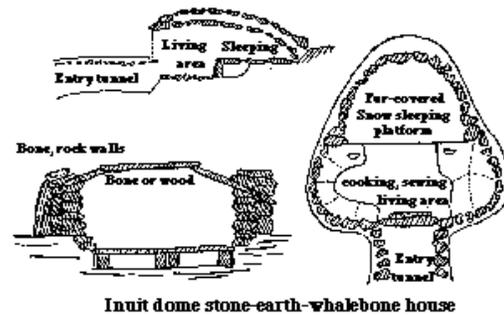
Qammaq Floor Plan and Cross Section - www.kstrom.net
